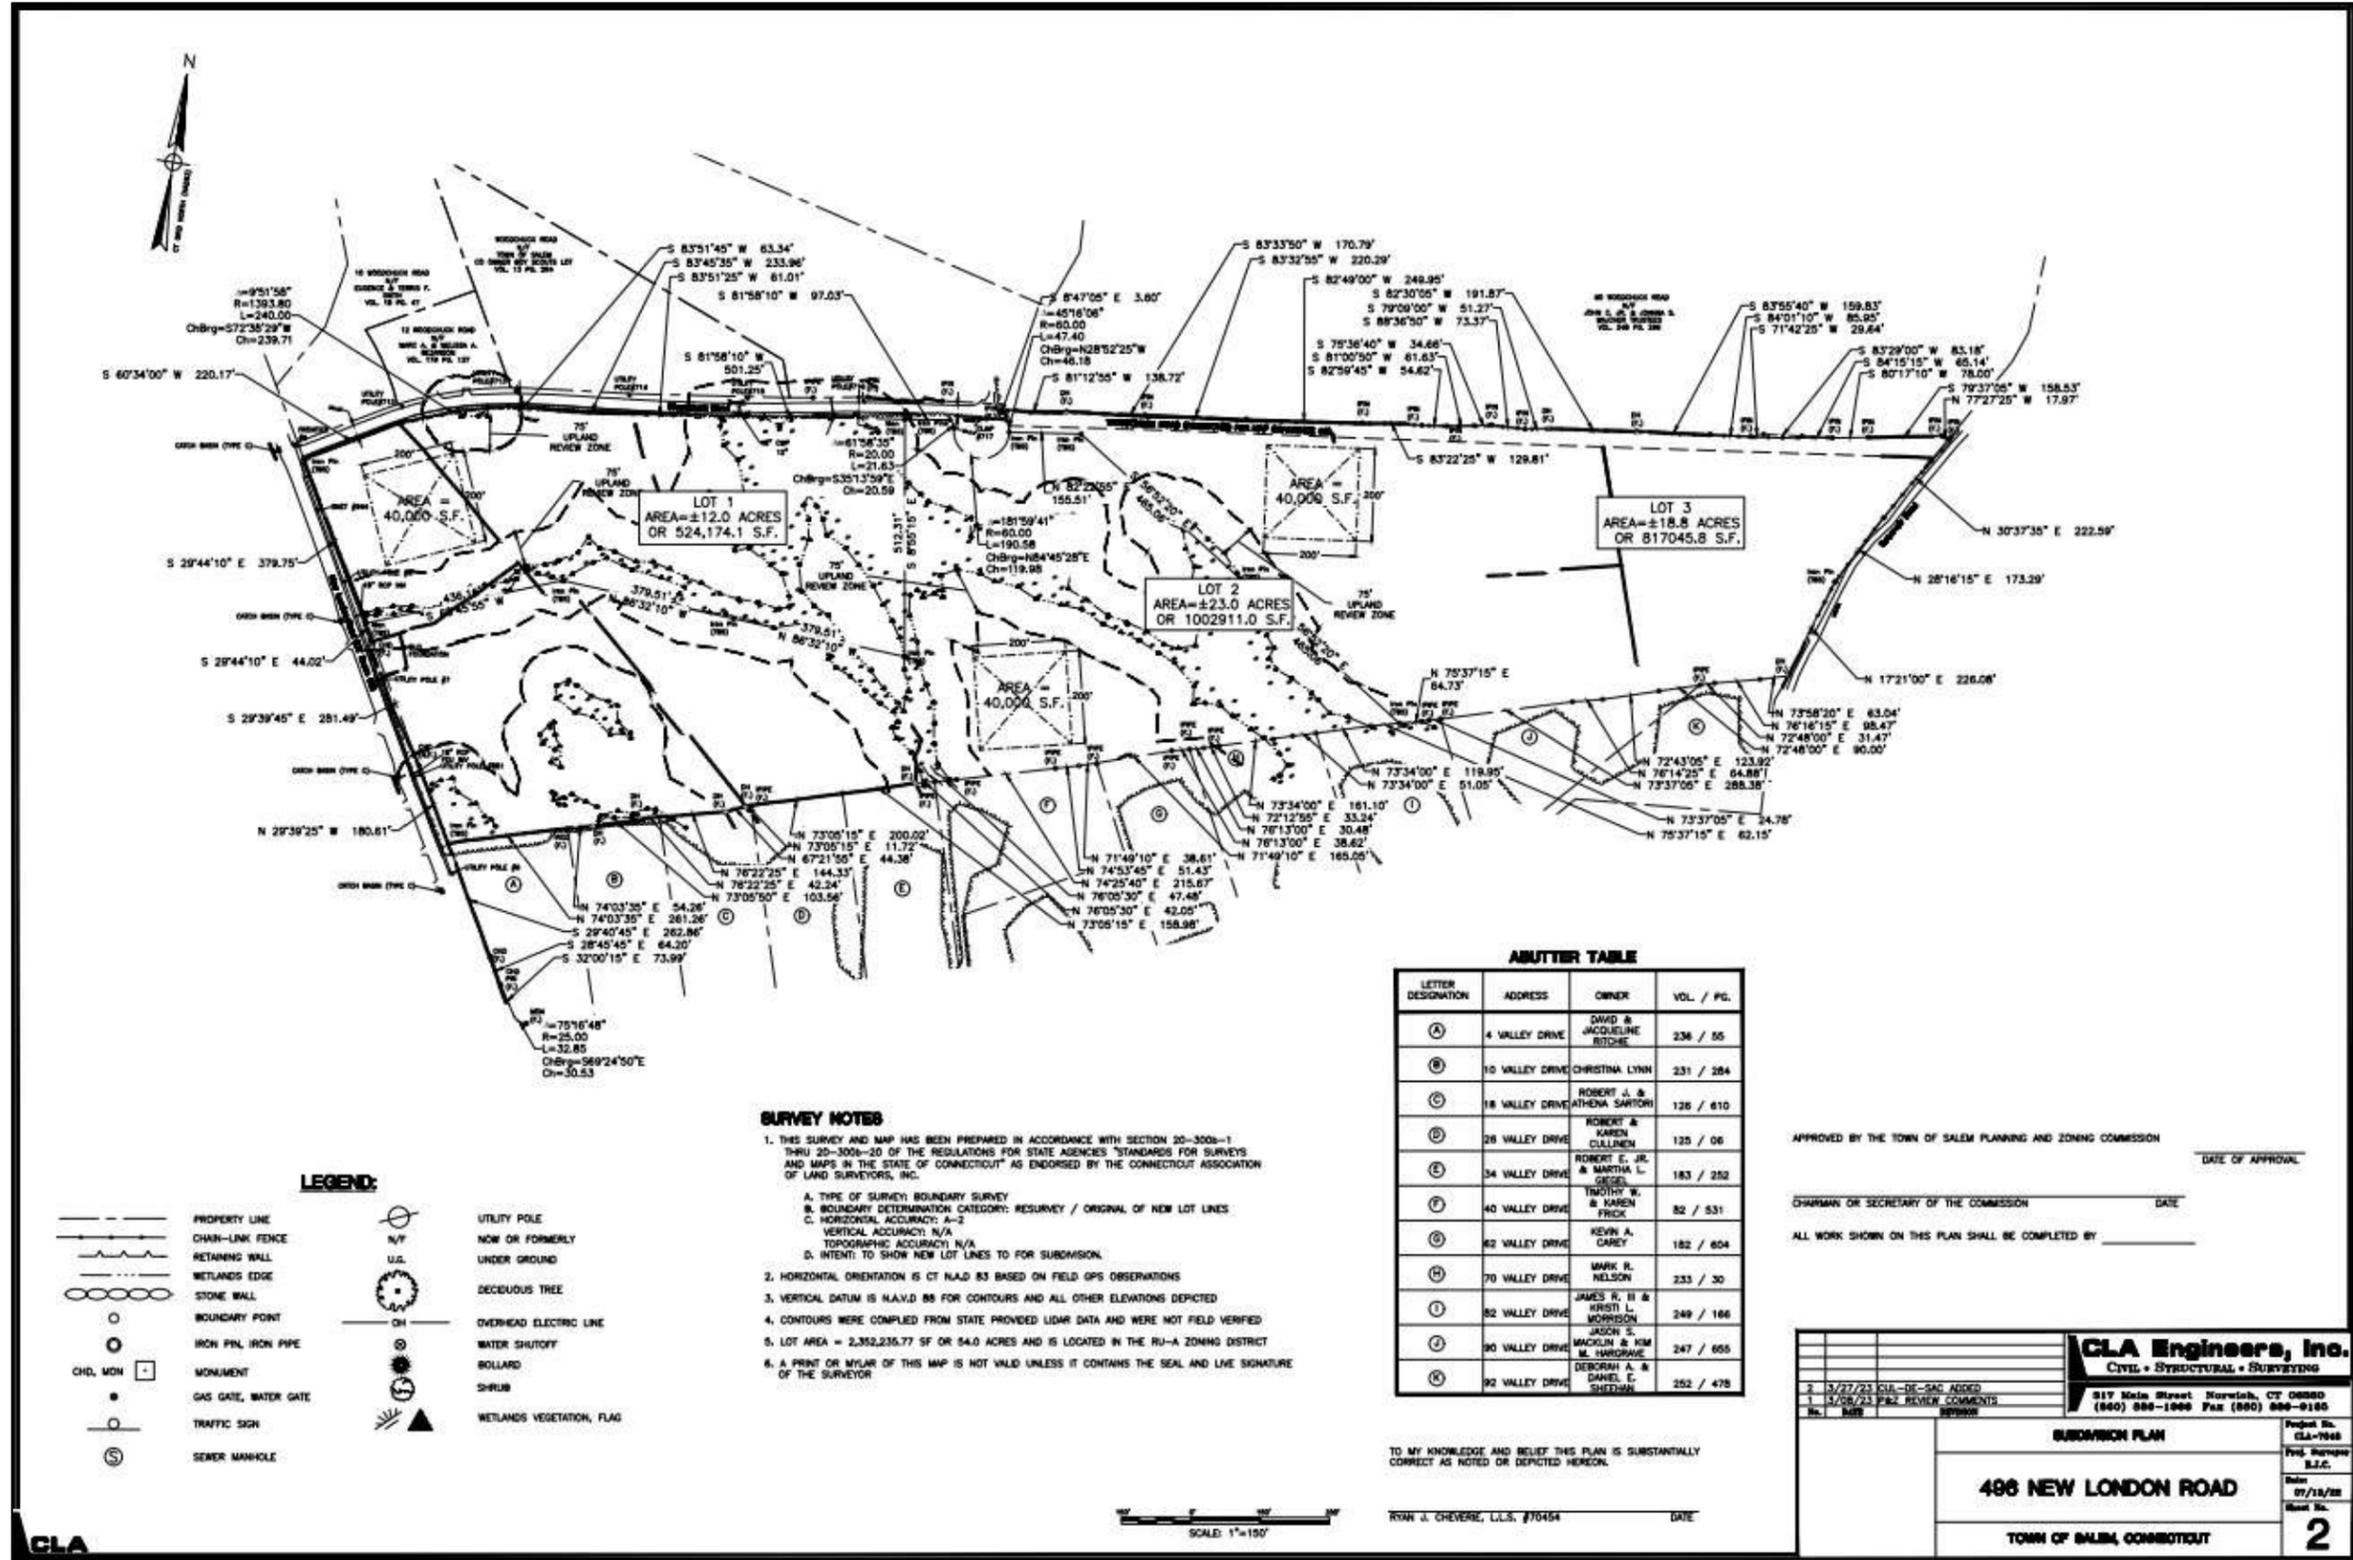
Project plans for the proposed Salem Landing Development Project located at 496 New London Road in Salem, Connecticut.
